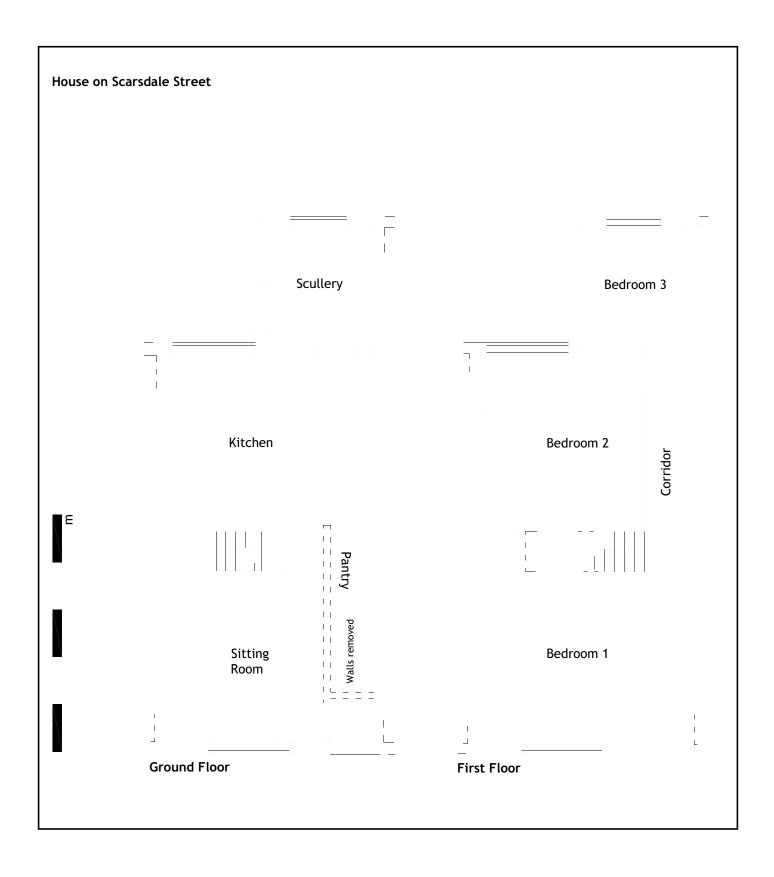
Floor plans of a former miner's house on Scarsdale Street, Carr Vale. Not to scale.
